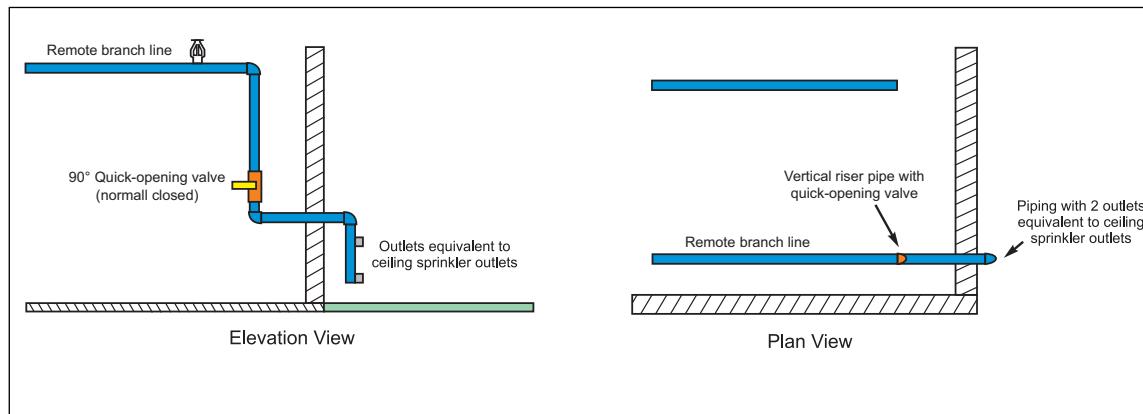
(a). Example arrangement of an inspector's test connection for a dry sprinkler system design using 2 sprinklers on the most remote branch line
